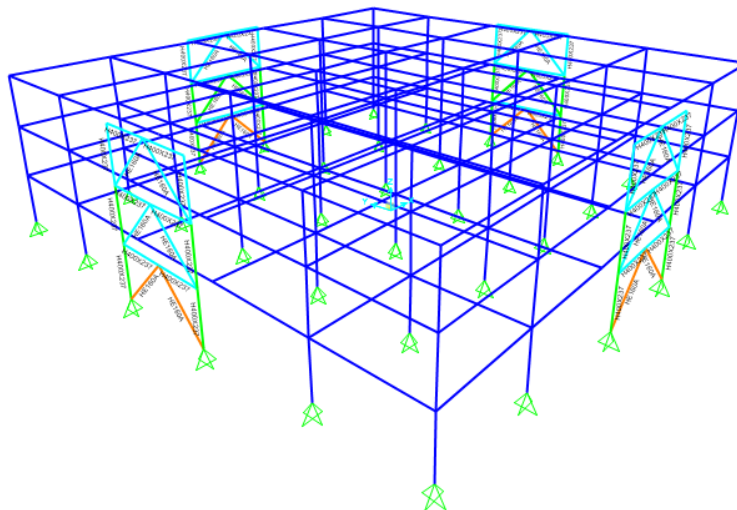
Design Results of Inverted V-Type Bracing System for 3-Story Strengthened Building Model
